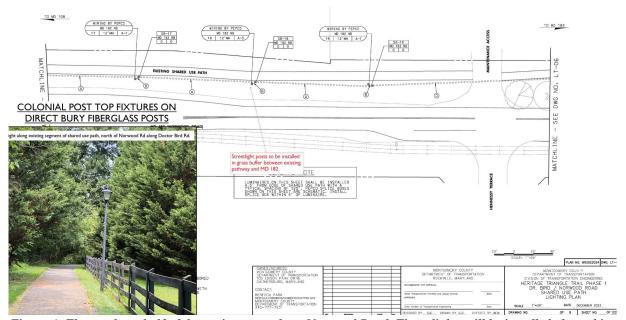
The northern half of the project area along Norwood Road. Three lights will be installed along this section.
